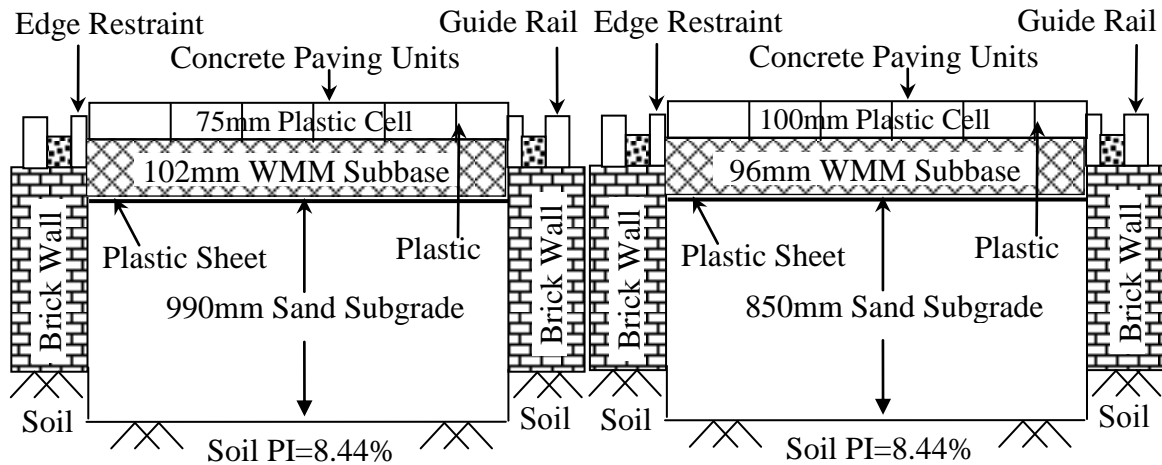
Plastic cell filled concrete block pavement of 75 mm and 100mm.
